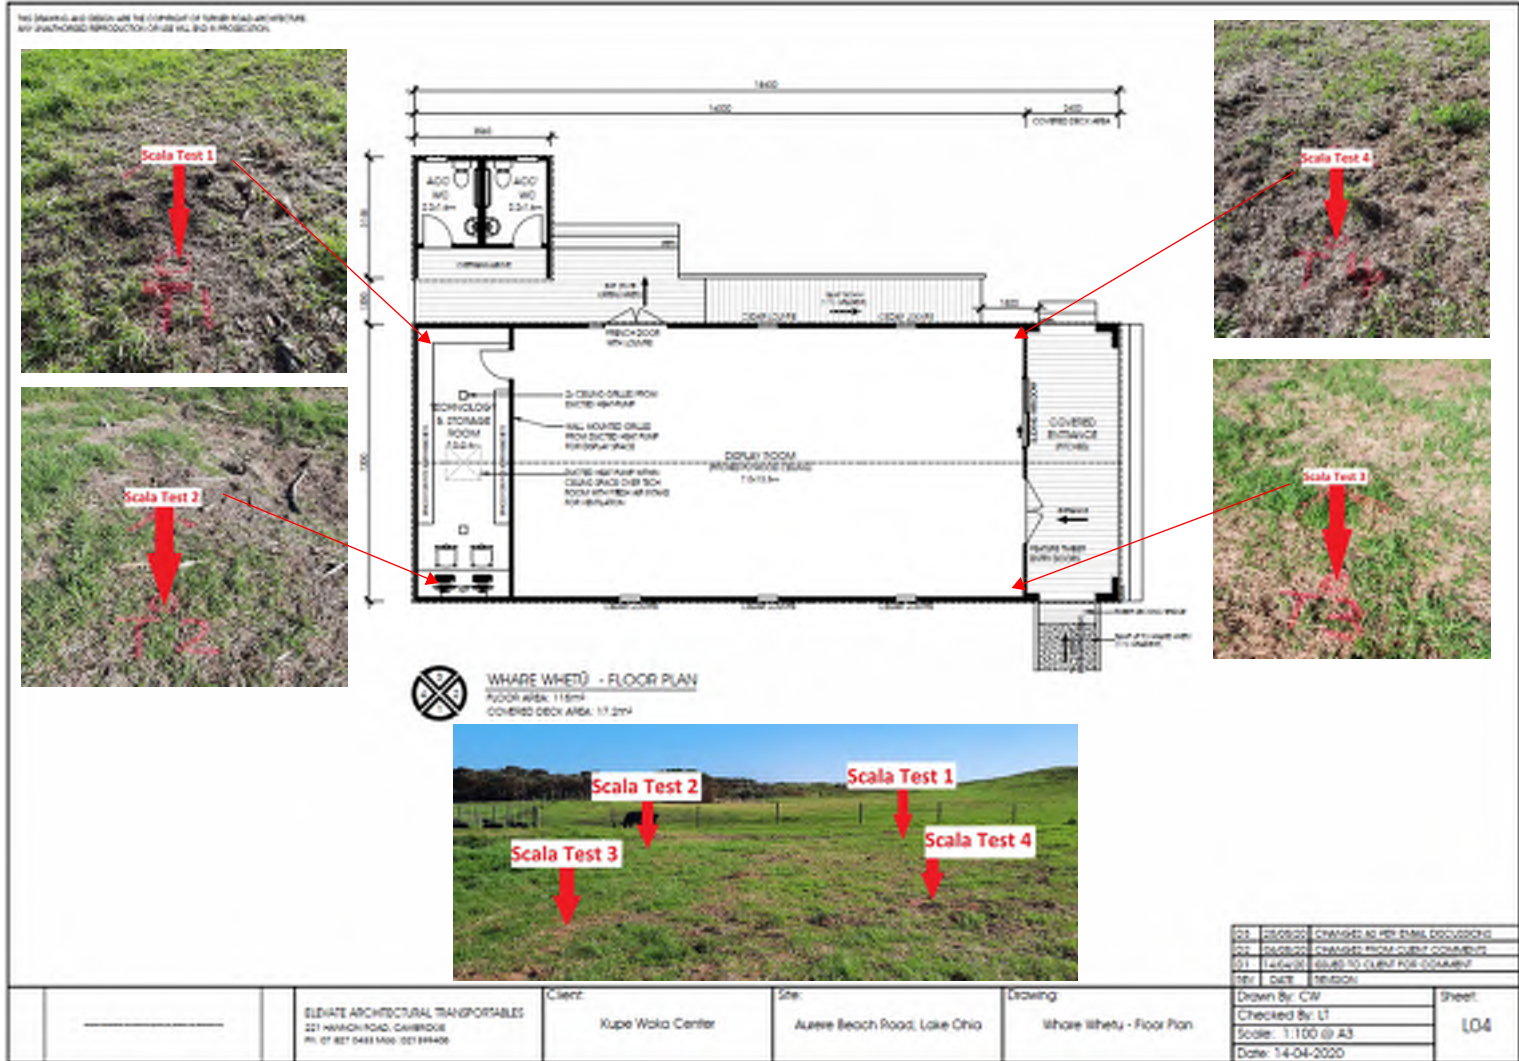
Floor plan for the proposed Whare Whetu building with Scala Penetrometer test locations and photos.
